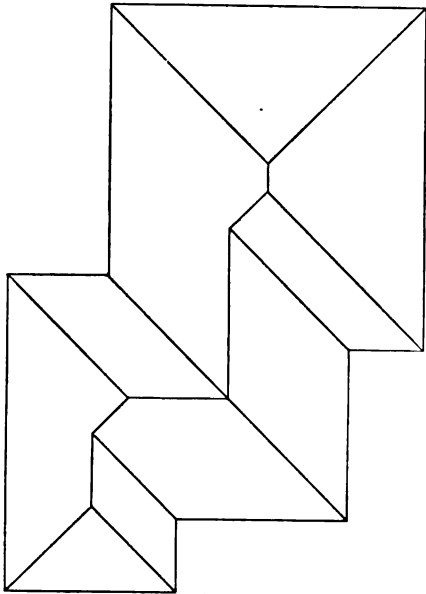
Outline of Roof Plan Furnished by Mr. Pynn.
